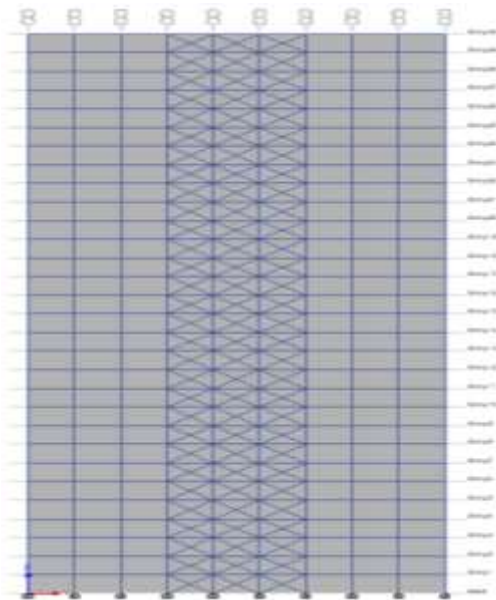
Elevation of 30 storey model HRB showing X-Bracing in three central bays at outer periphery.
